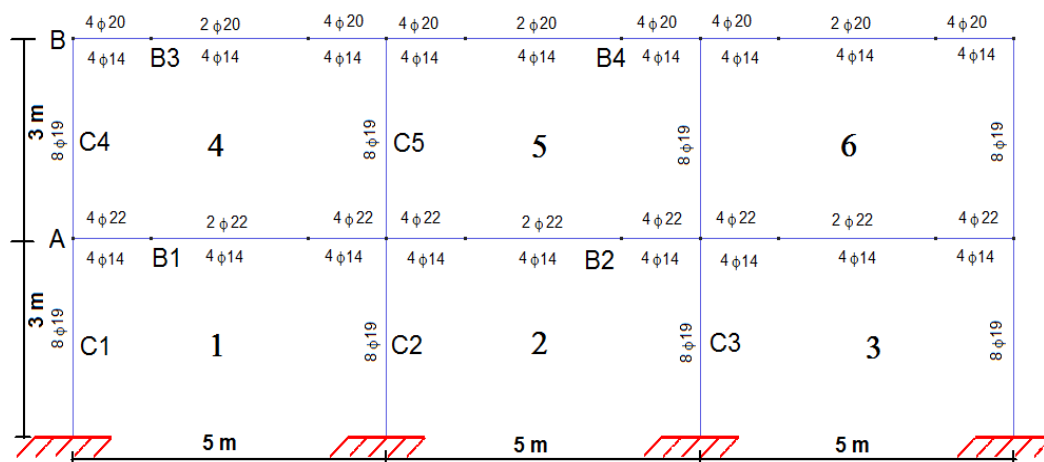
Frame geometry, support conditions, reinforcement, numeration of: beams, columns, joints and bays
